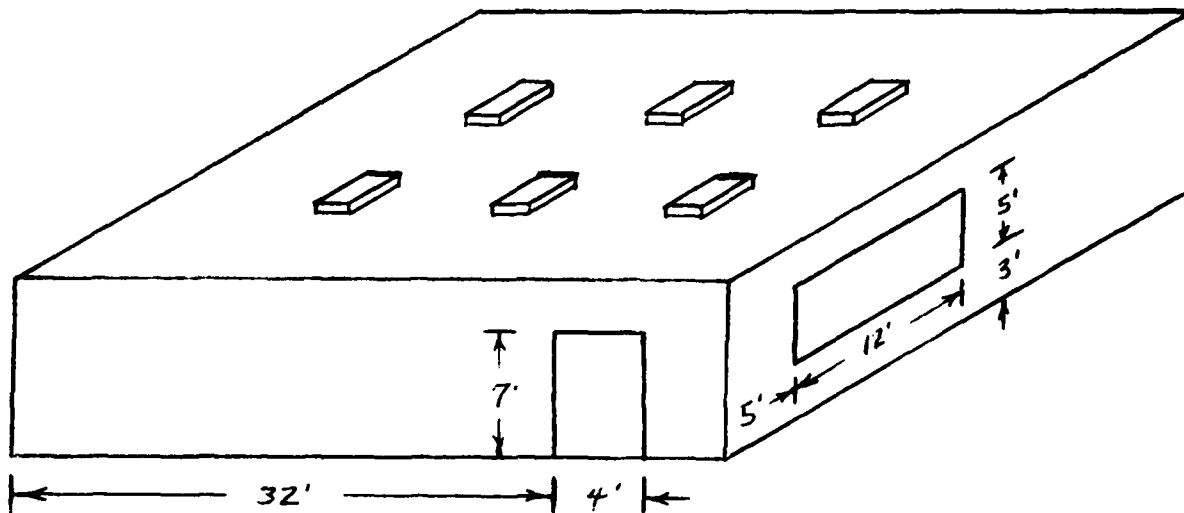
Room Layout for Example 4. This example illustrates room surface inserts -- in this case a door and chalkboard.
